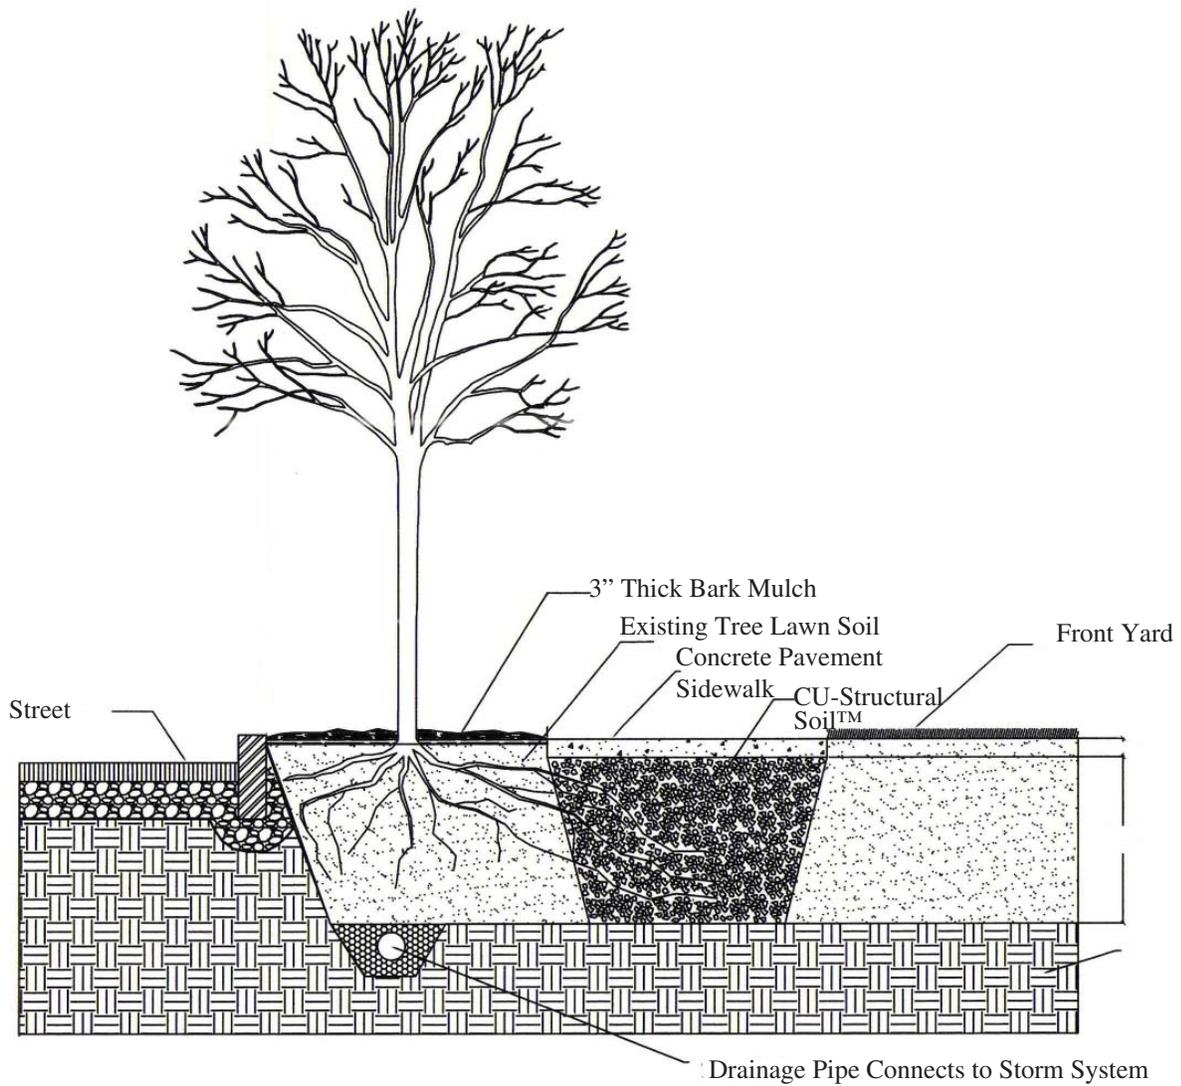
CU-Structural Soil™ break-out zone from narrow tree lawn to adjacent landscape area
